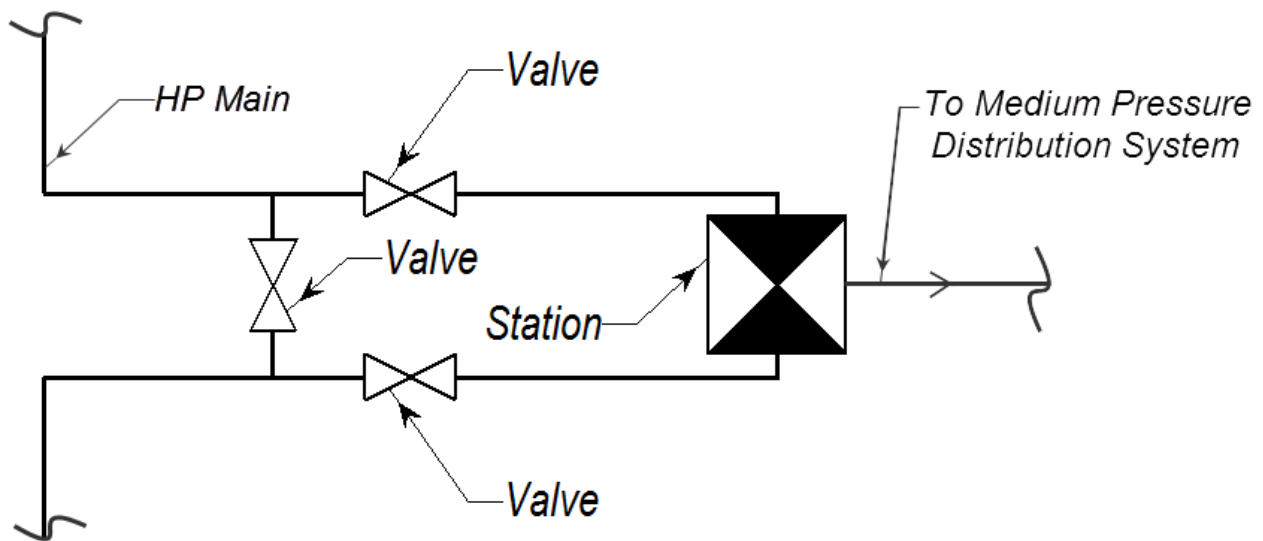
TYPICAL D-VALVE ARRANGEMENT
